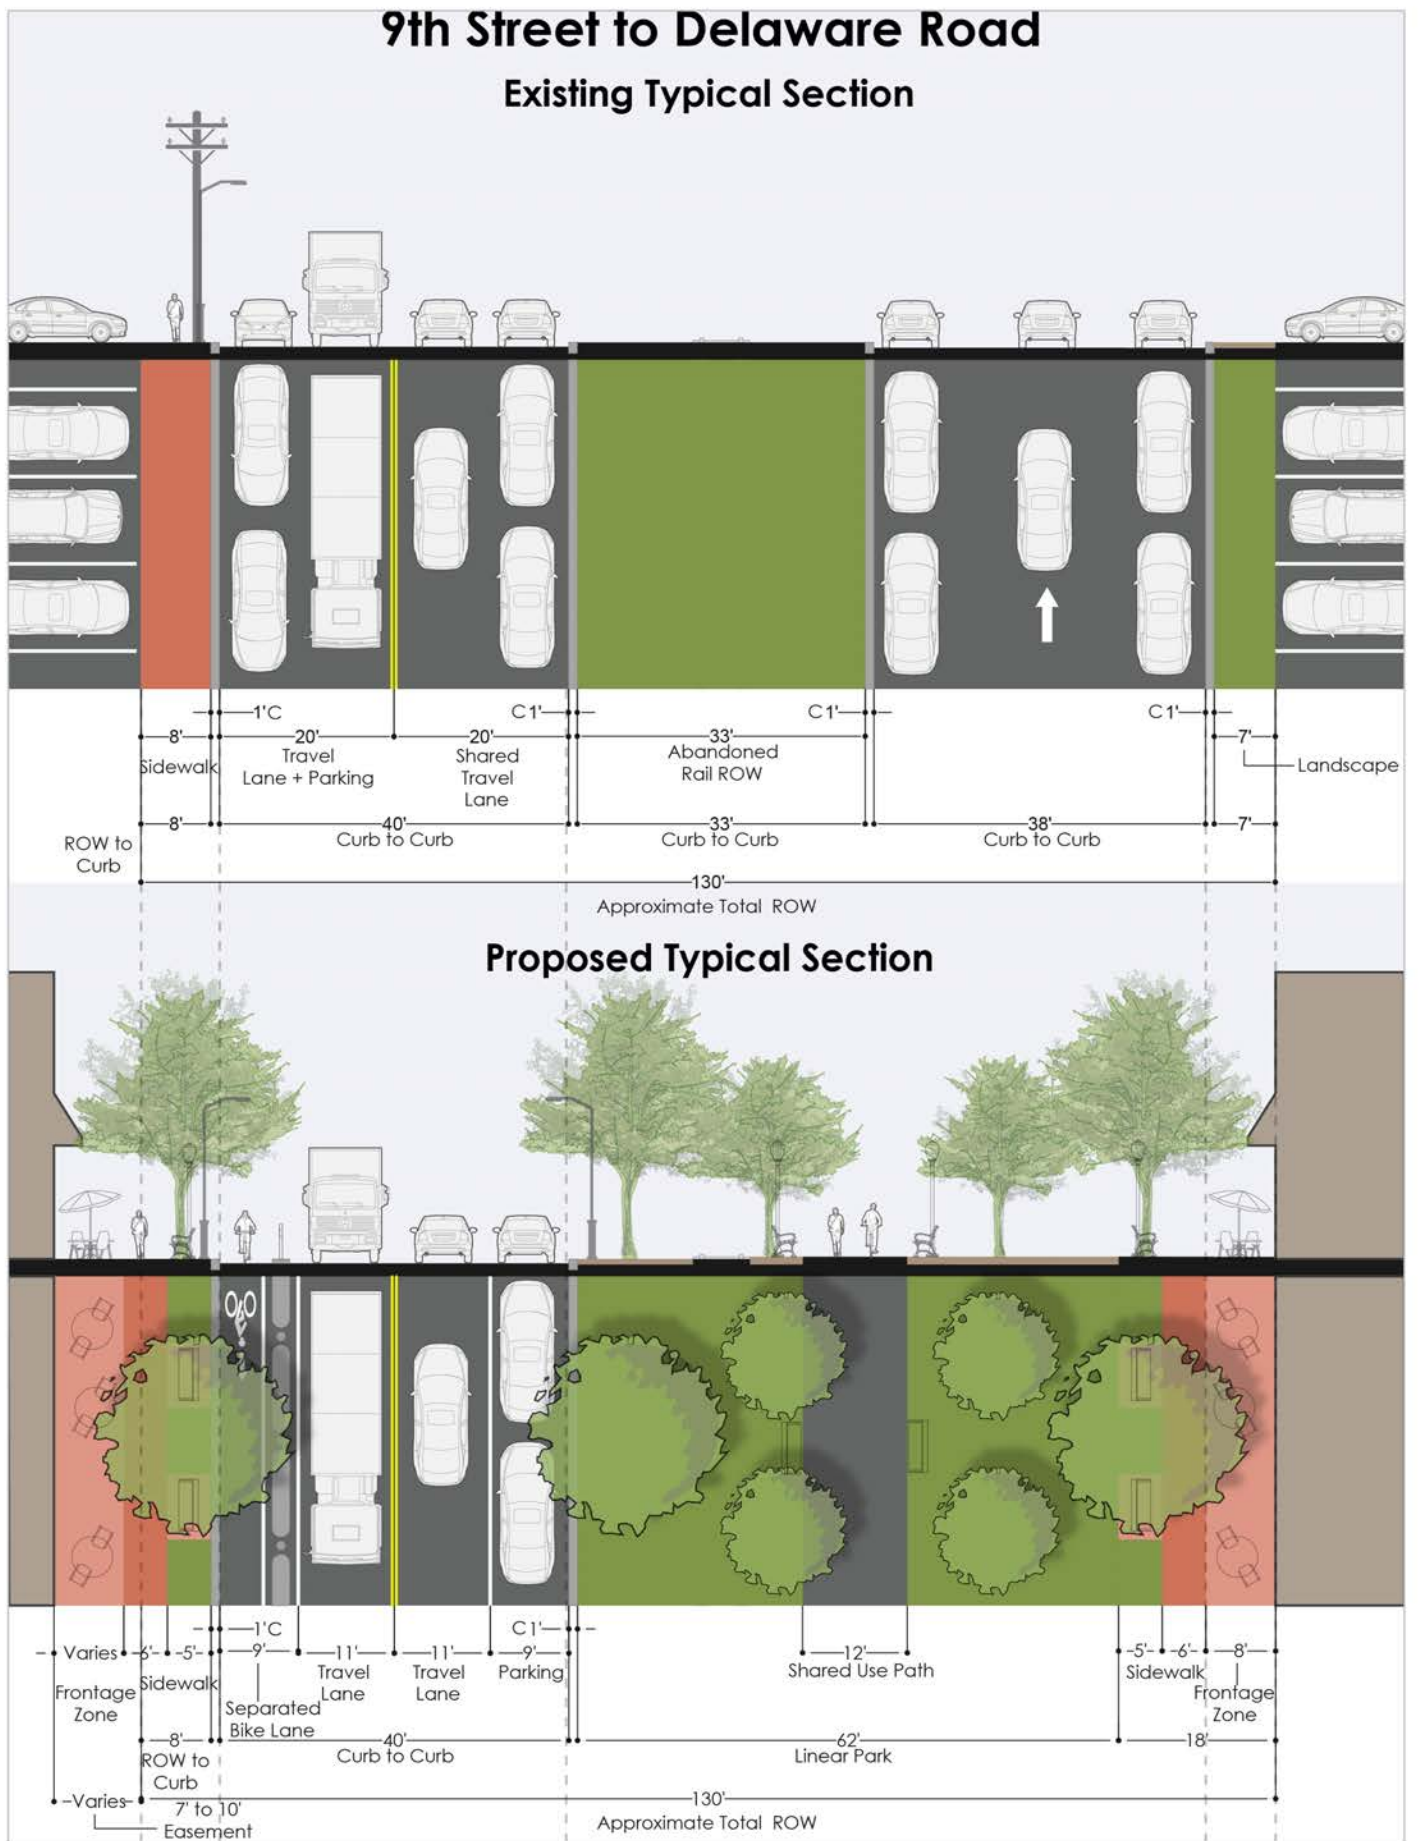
Existing and Proposed Typical Section - 9th Street to Delaware Road
